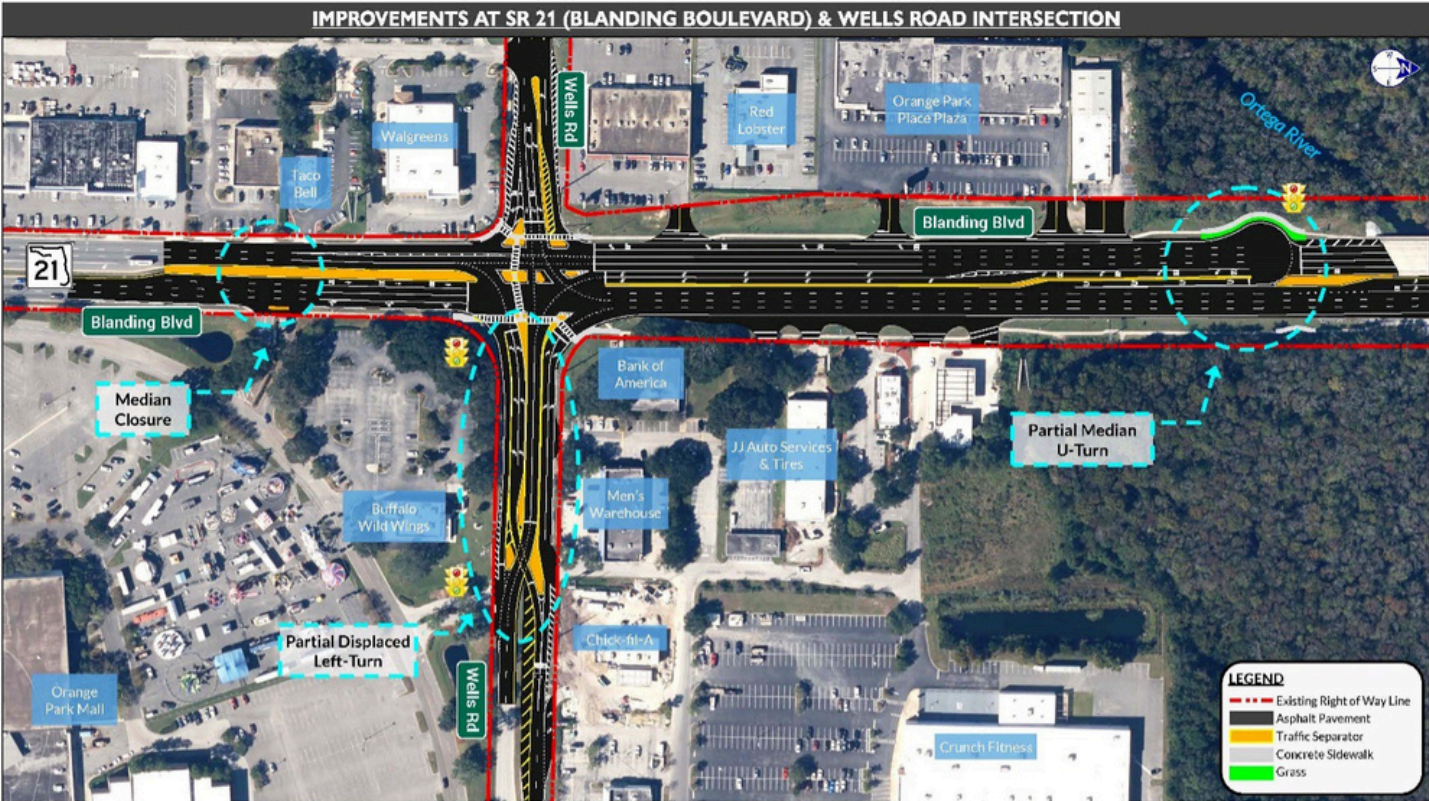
PHOTO: FDOT proposed changes to the Blanding Boulevard/Wells Road intersection
